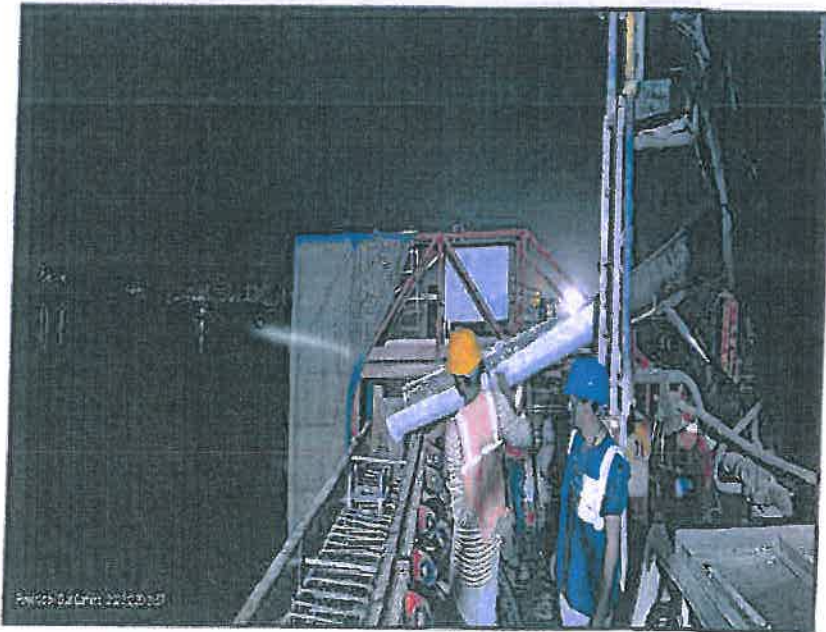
Crash barrier concrete in progress at Span MP 212-213 LHS.
